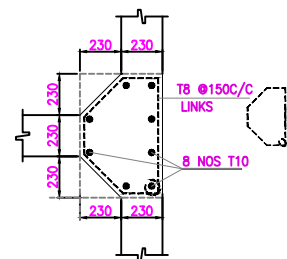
DETAILS OF HORIZONTAL REINFORCEMENT AT CORNER (PLAN)
